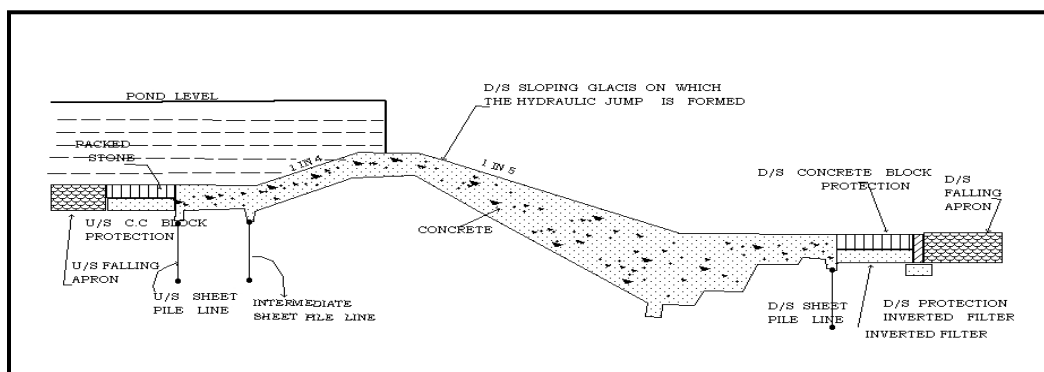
(c) - Typical Cross-section of a Modern Concrete Weir with Permeable Foundation.
